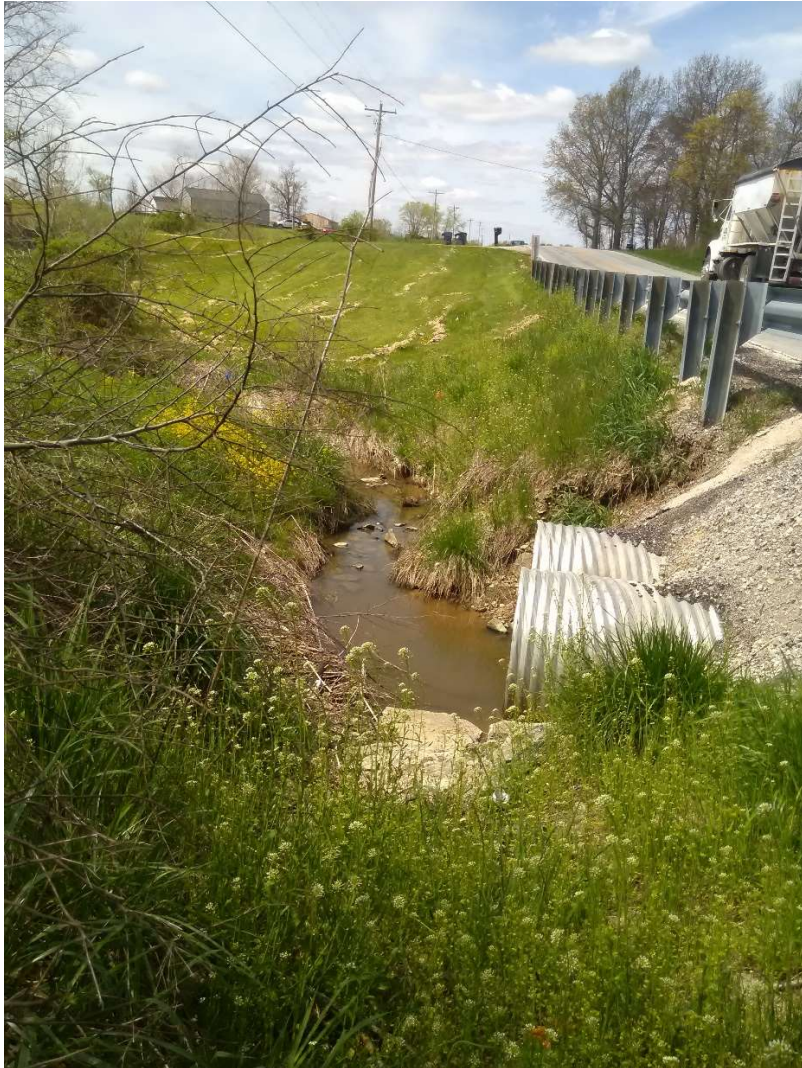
Facing west at UNT 1 to Branch and structure inlet. (4.16.21)
